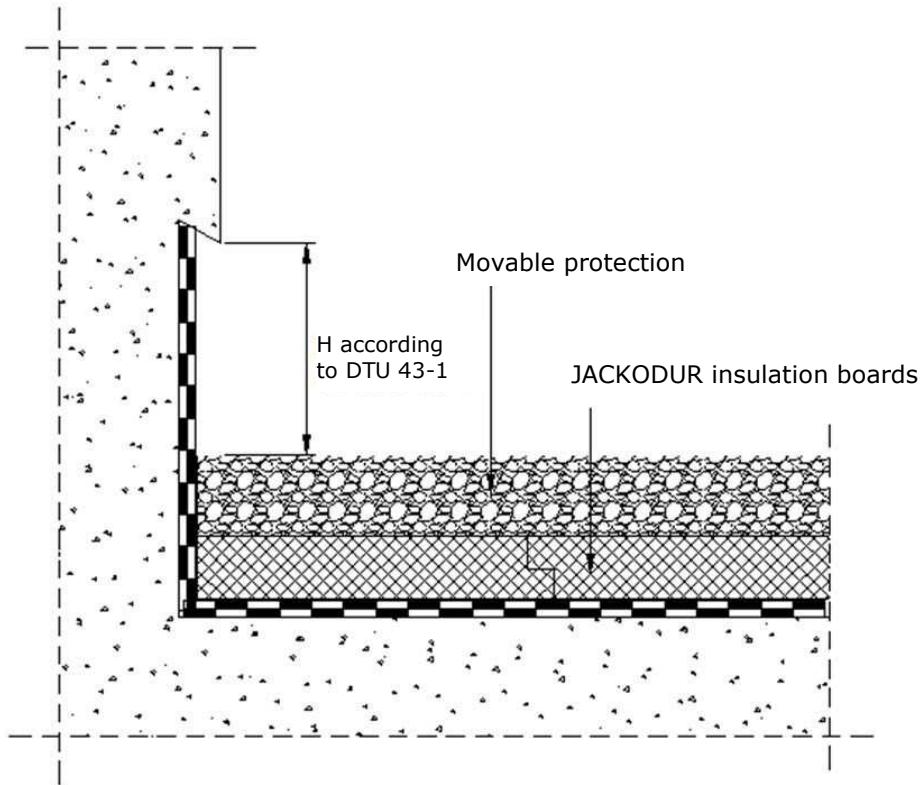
Sectional view of JACKODUR boards E = 220 to 320 mm
